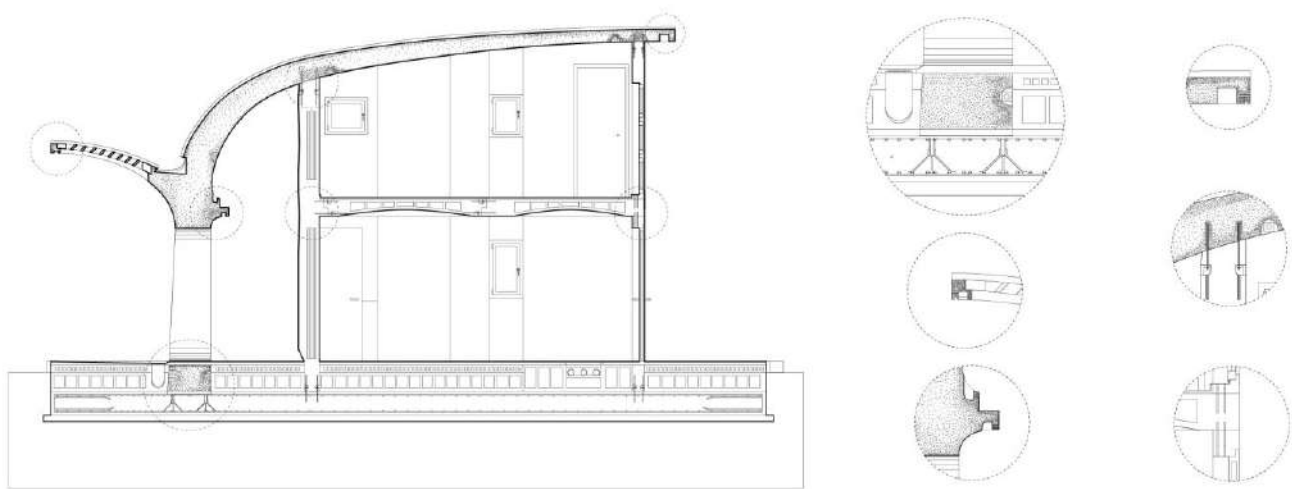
Building details that satisfy the criteria of flexibility and reversibility of use of the system's components. The foundations built during 'peace time' feature anchor bolts for erection of the roof structures. The floor slab features roughed-in connections for wiring, cabling and plumbing in correspondence with the servant spaces.
